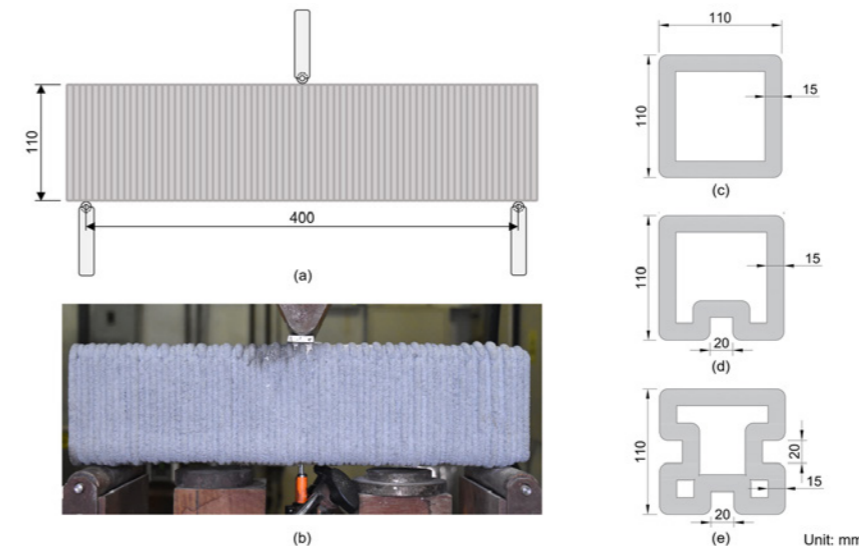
Test setup for flexural bending tests of the 3D printed beams
